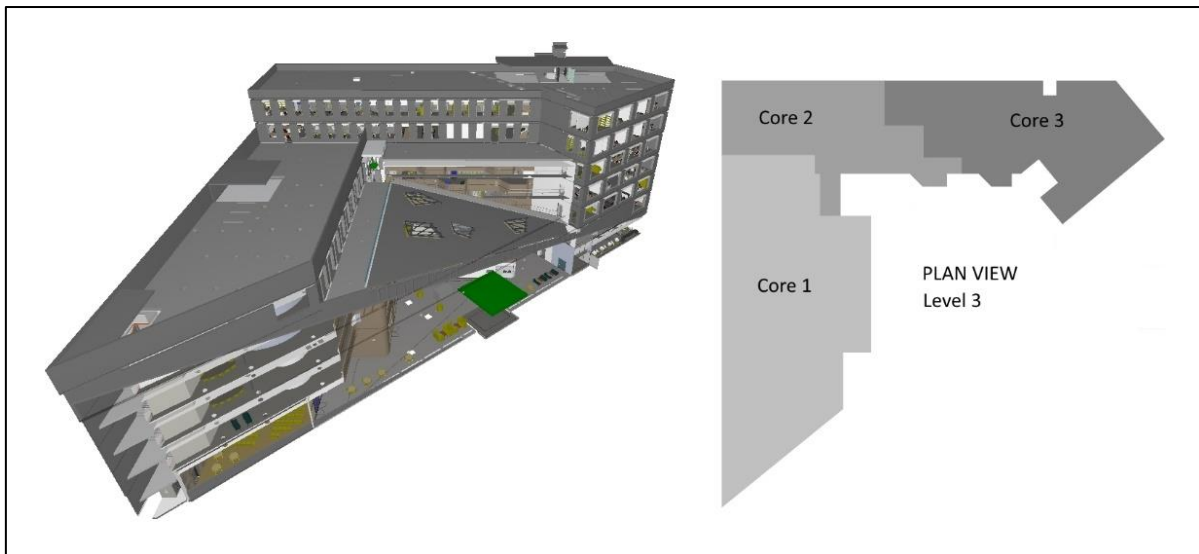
A 3D architectural IFC model of the Urban Sciences Building, Newcastle upon Tyne, UK, and a plan view of the electrical supply zoning layout for the third floor.
